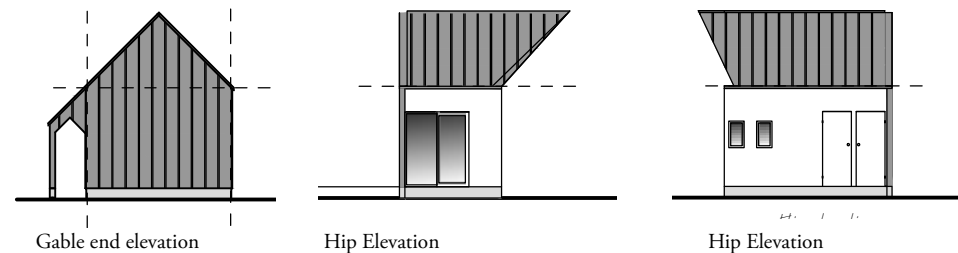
Branch House* elevations drawn by author. The angles distort the elevation so only sections of the elevation have been shown.
